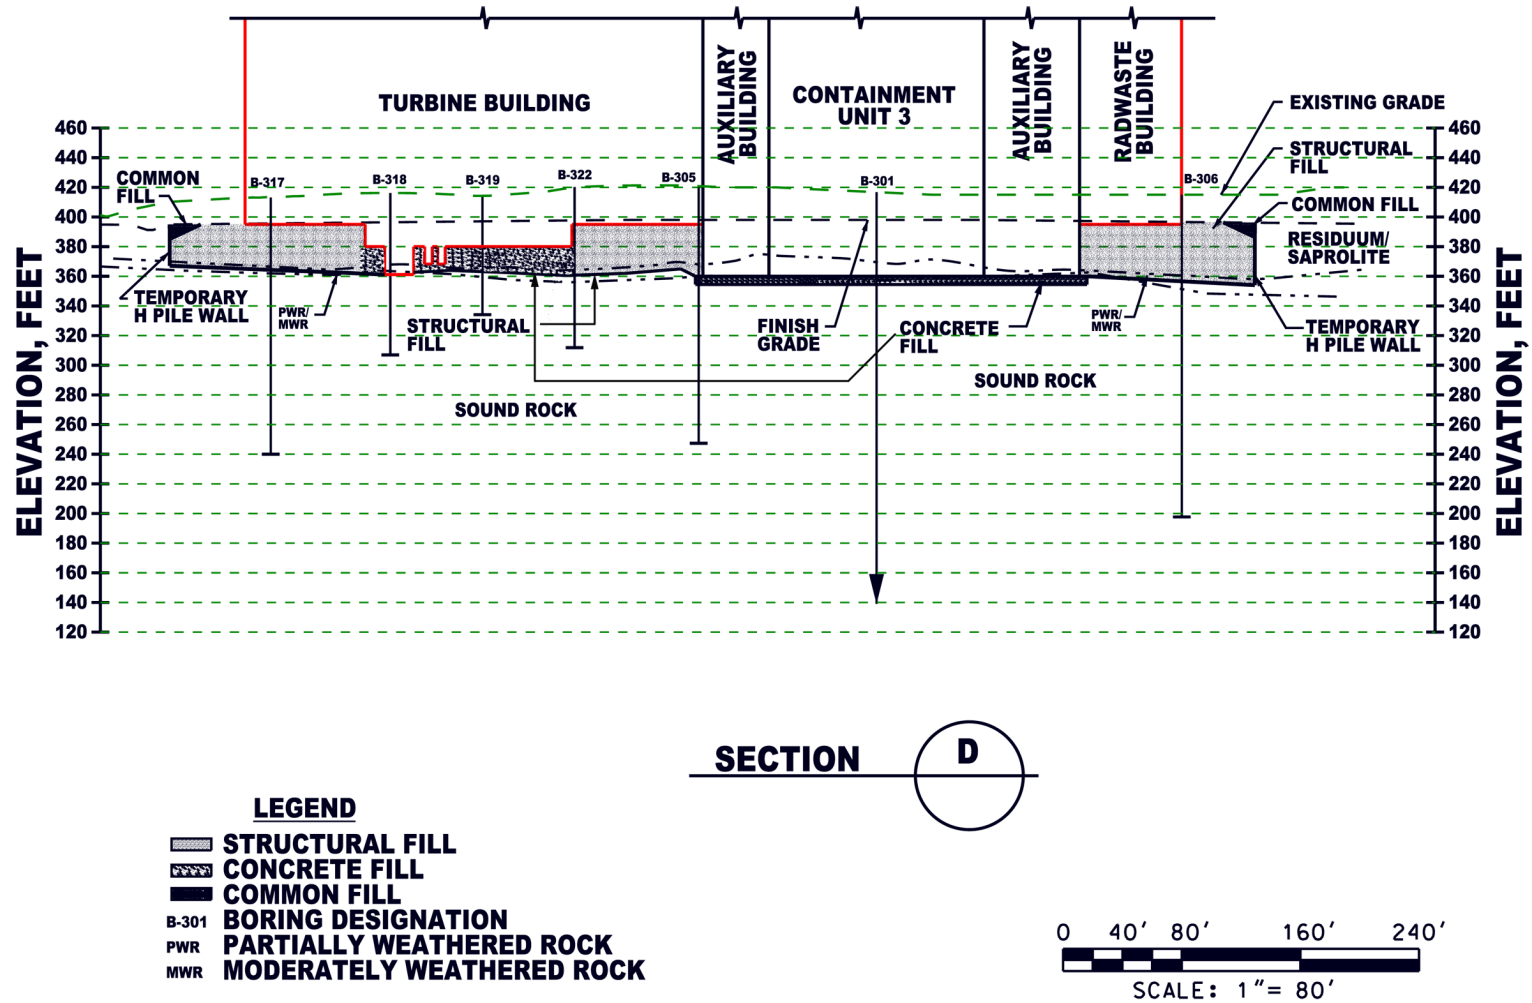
Cross-Section of Structure Foundation D-D
